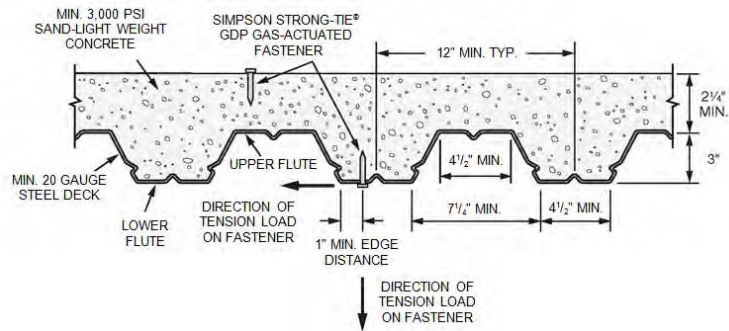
A—GDP GAS-ACTUATED FASTENER AND GRH AND GAC ASSEMBLIES INSTALLED IN CONCRETE FILLED 3-INCH-DEEP COMPOSITE FLOOR “W” DECK
